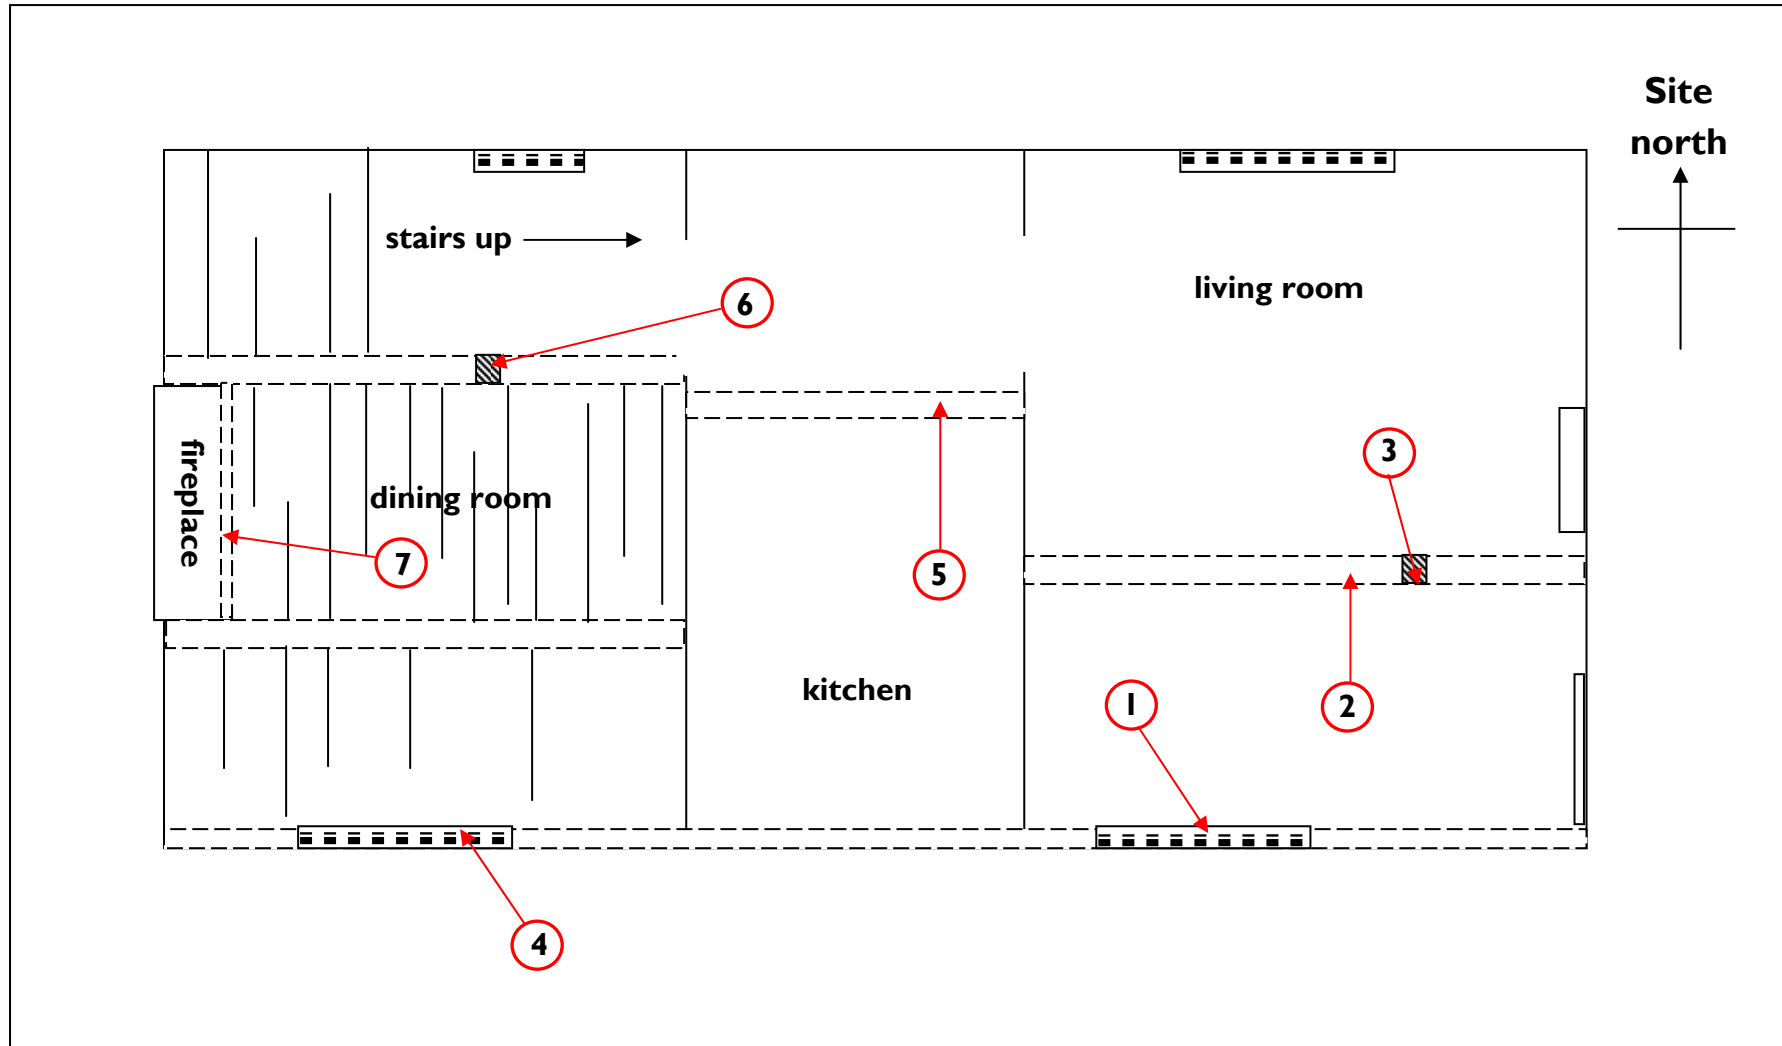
Simple sketch plan at first floor level to show sampled timbers
